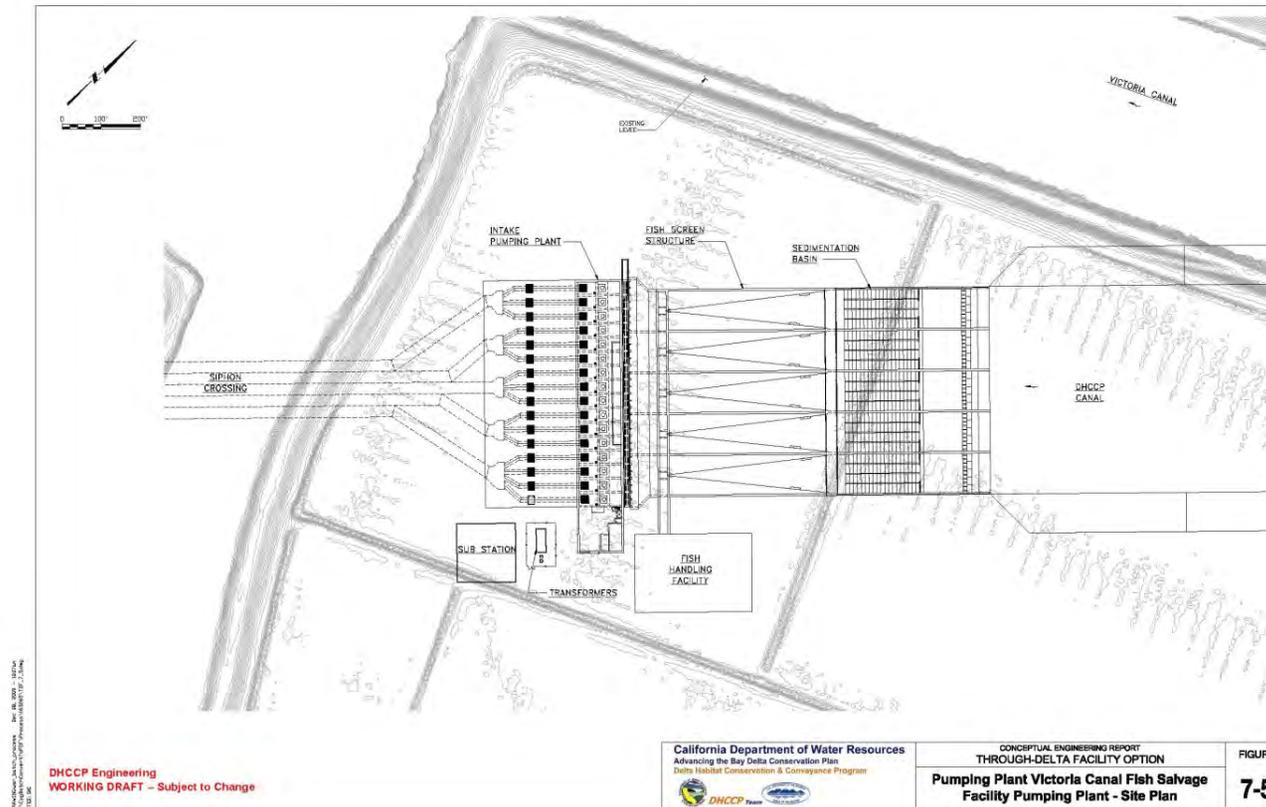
Pumping Plant Victoria Canal Fish Salvage Facility Pumping Plant – Site Plan
